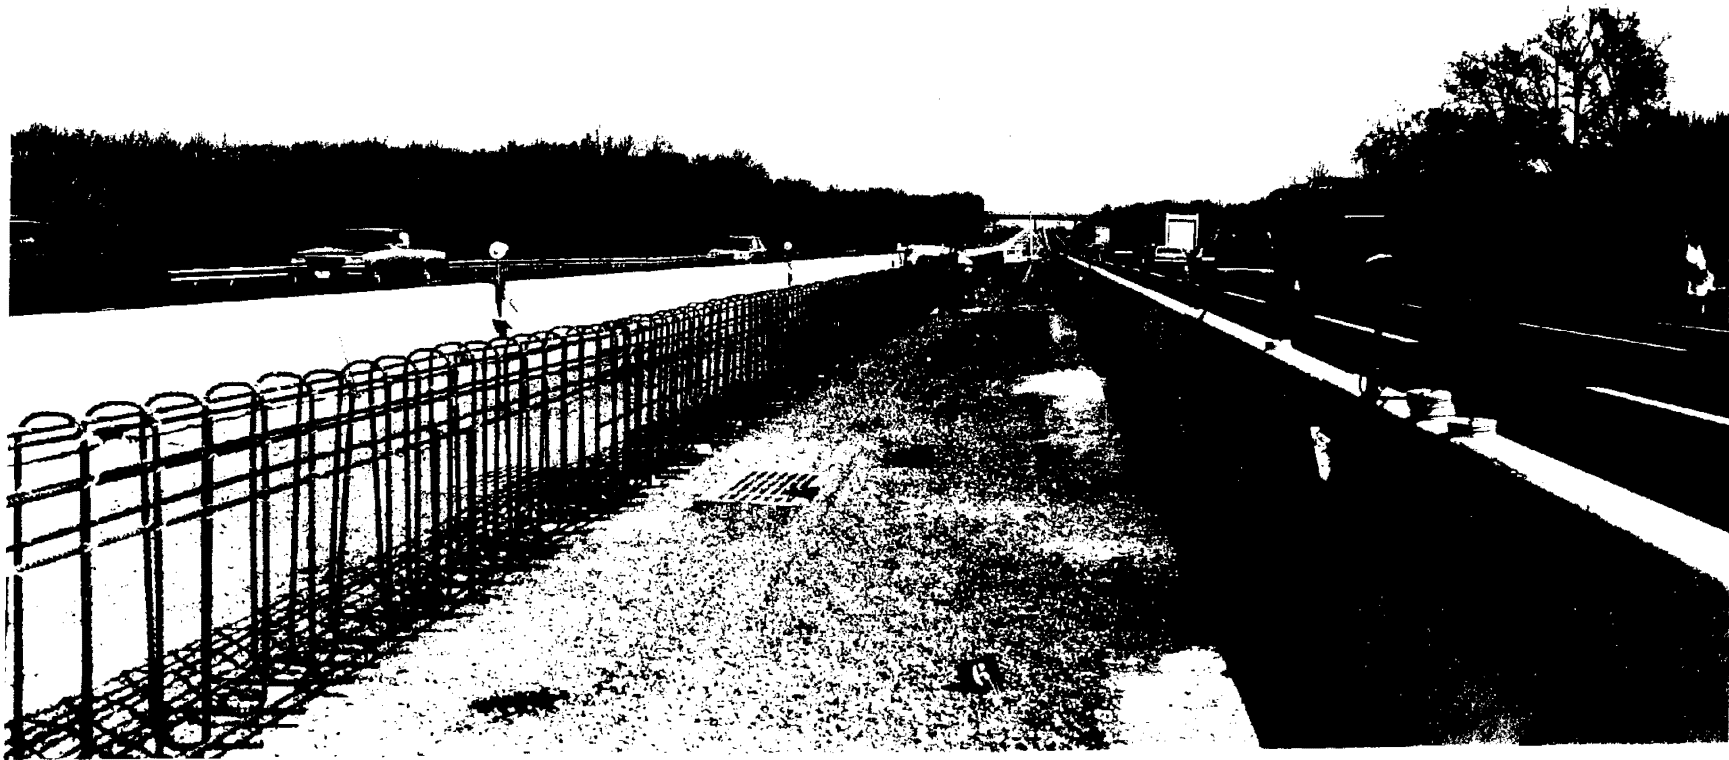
Construction site showing grading, reinforcing steel in place, and movable protective barriers.
